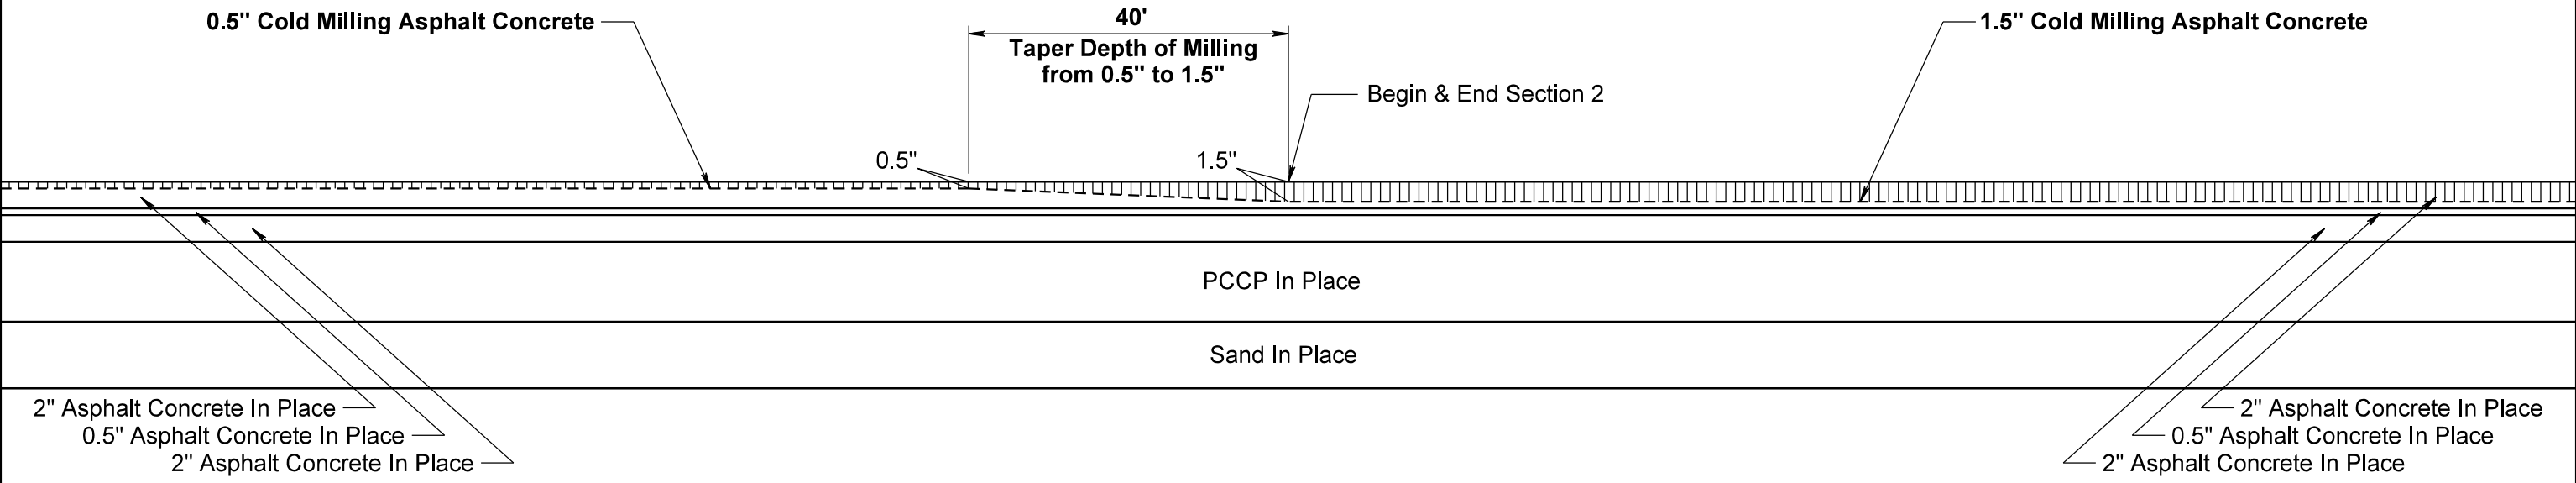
DETAIL FOR COLD MILLING TAPER AT BEGIN & END SECTION 2
